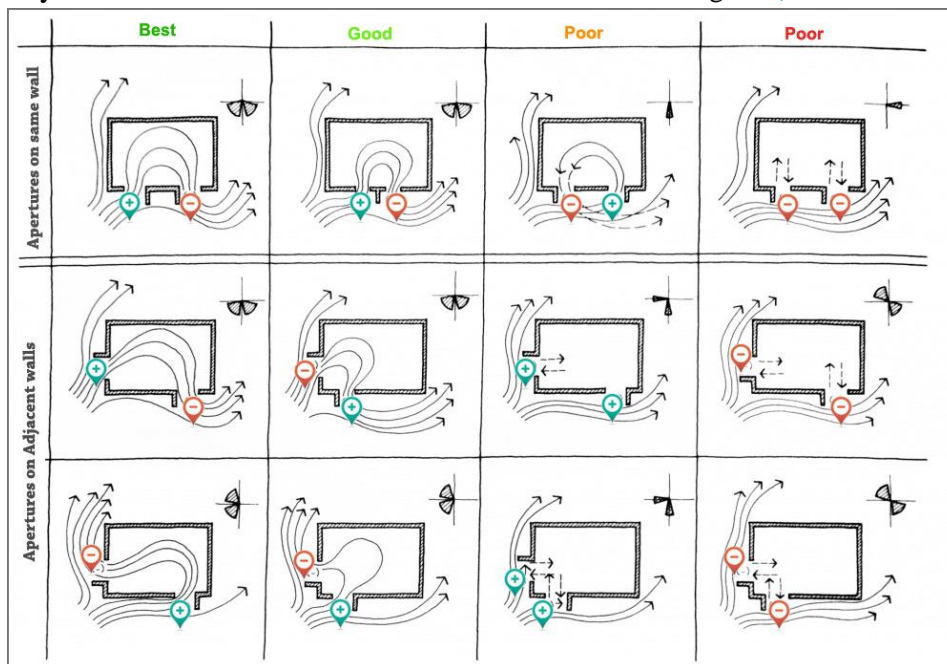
Openings on adjacent walls and wing walls (Source: Mechanical and Electrical Equipment for Buildings, 8th Ed. Stein, Benjamin; Reynolds, John S. published by Wiley Hardcover, December, 1991. )
